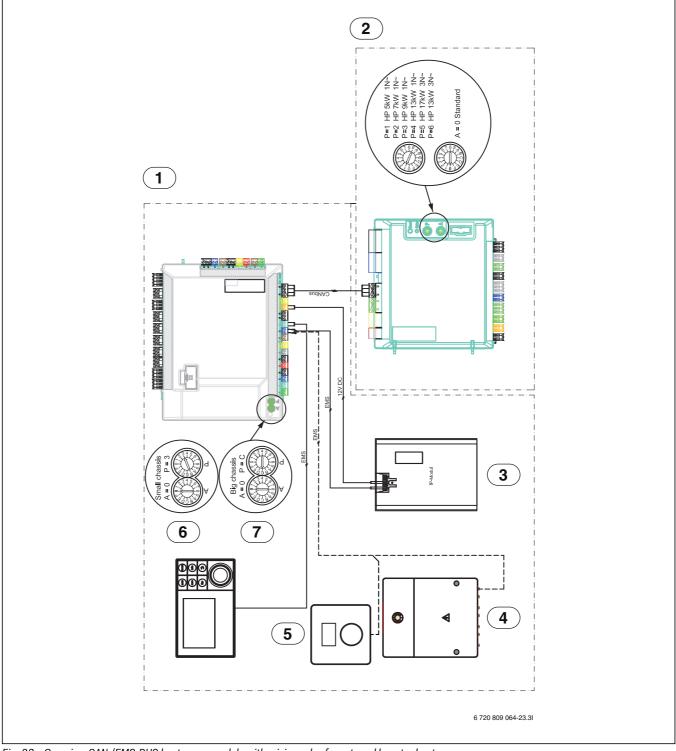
Overview CAN-/EMS-BUS heat pump module with mixing valve for external booster heater
